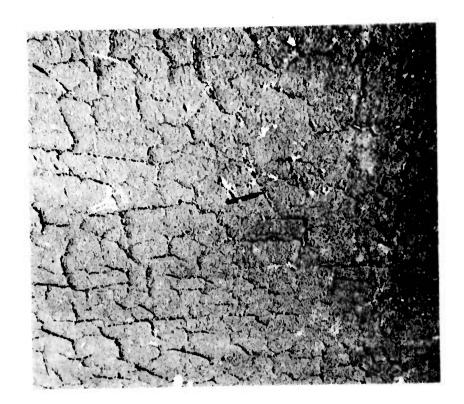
Typical longitudinal and transverse cracks in asphaltic concrete (425 ft from the north end of N-S runway)
